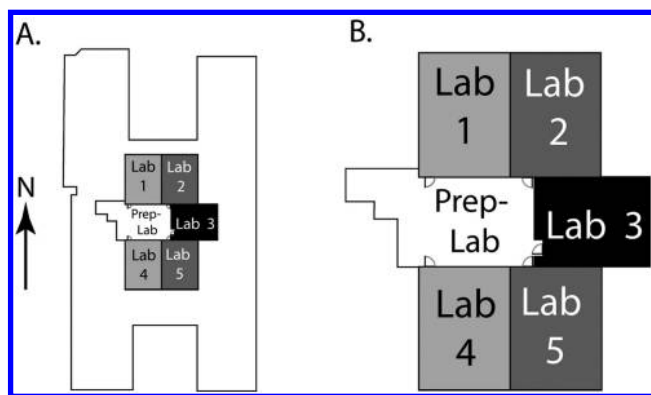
A. The 3rd-floor general chemistry laboratory area within the center core of the building. B. An expanded view of the 3rd-floor labs.
